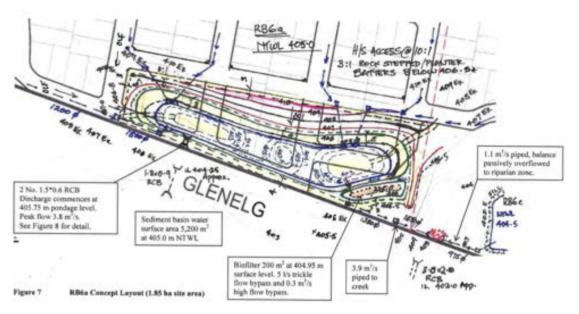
RETARDING BASIN 6A FUNCTIONAL DESIGN LAYOUT
